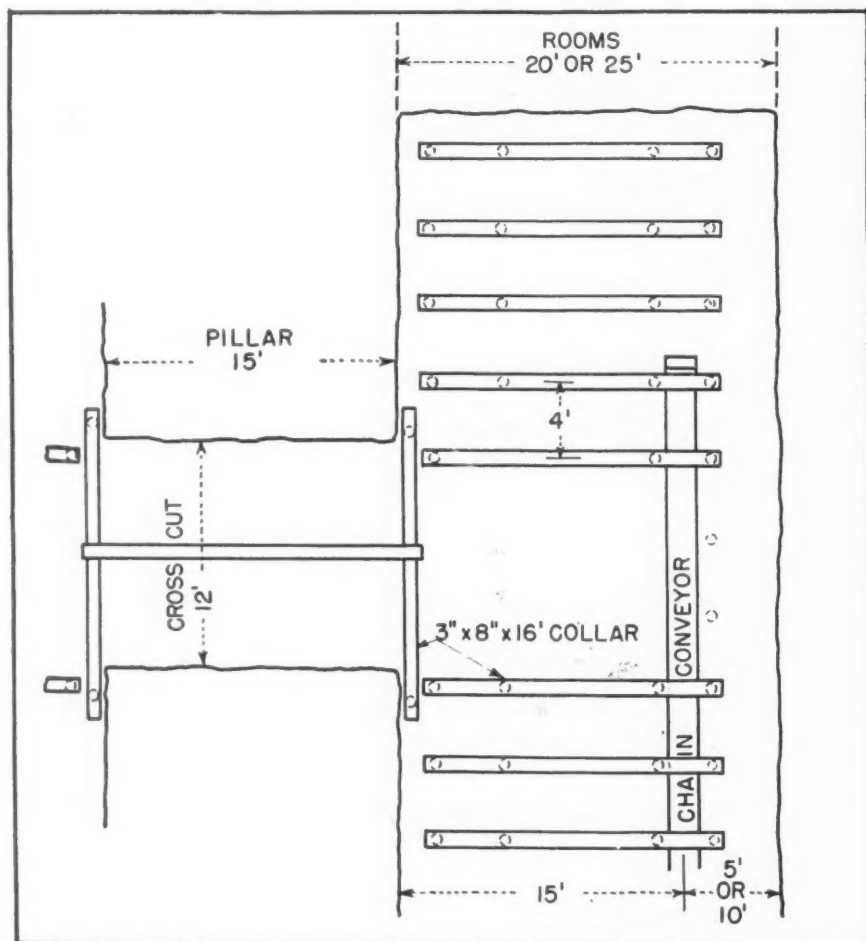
ROOM AND CROSSCUT timbering plan in the America seam.
